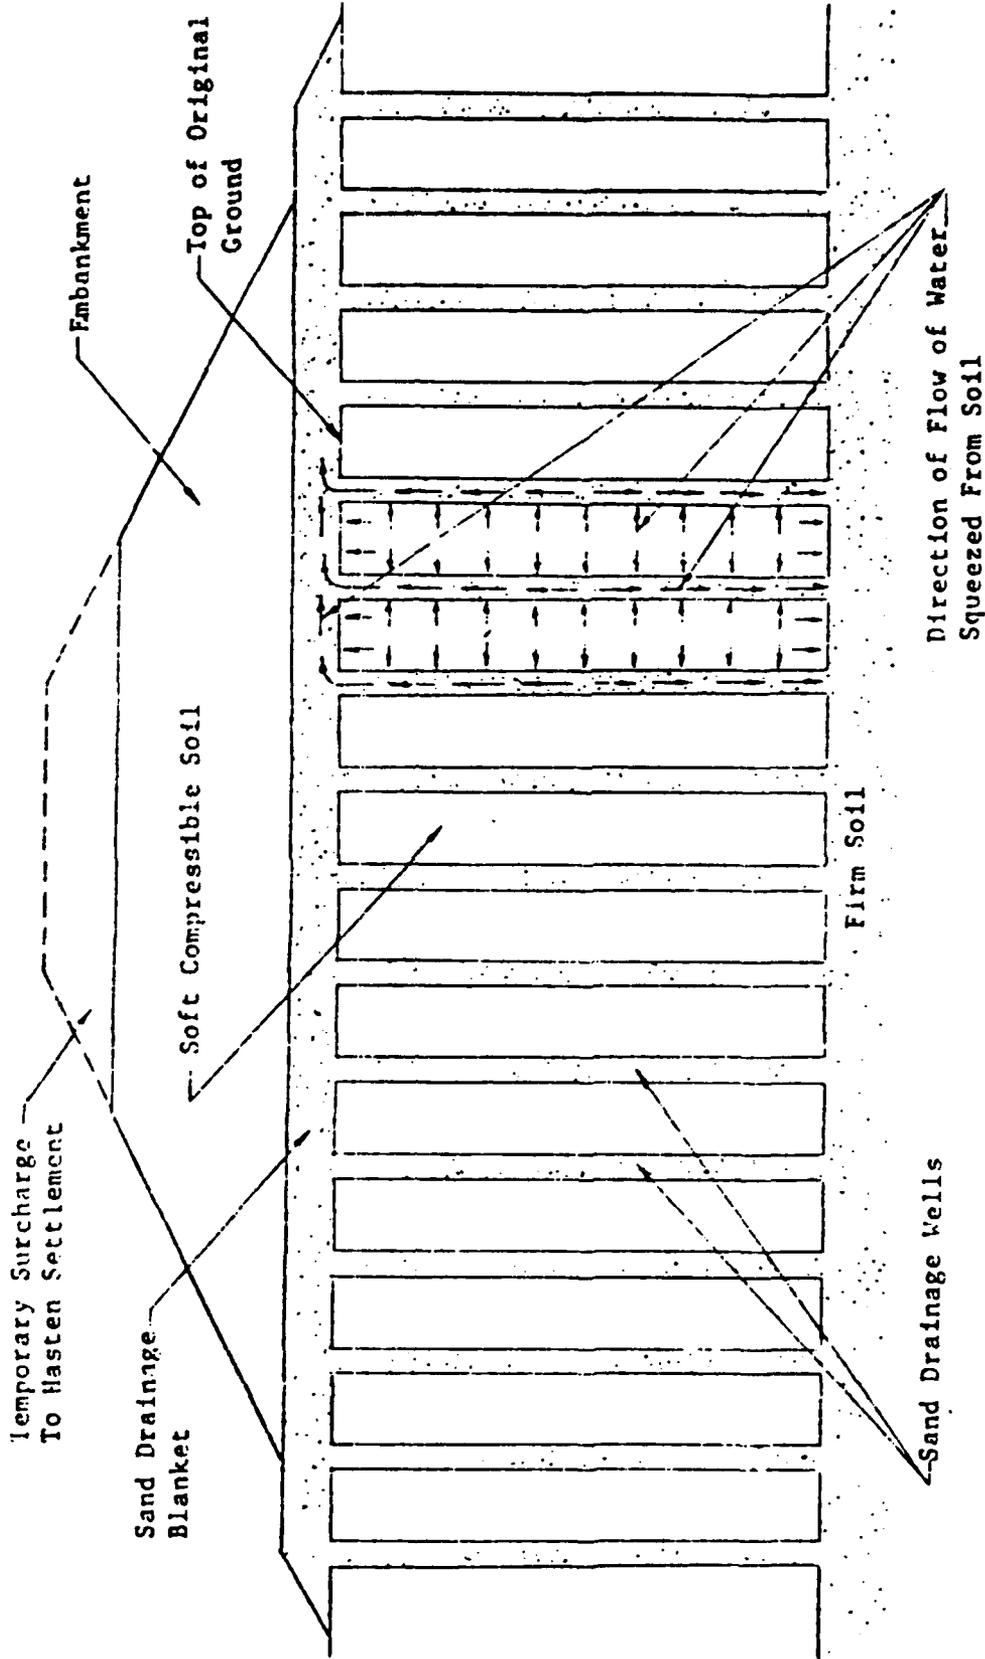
Typical Sand Drainage Well Installation (Ref. 11).
